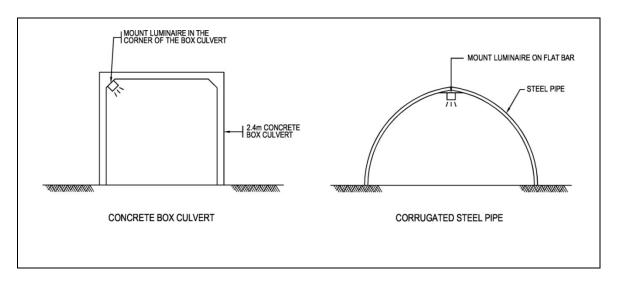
Typical Pedestrian and Bicycle Tunnel Lighting
